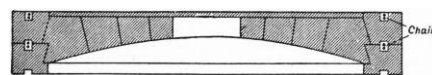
Floor, Smeaton's Eddystone Lighthouse.
